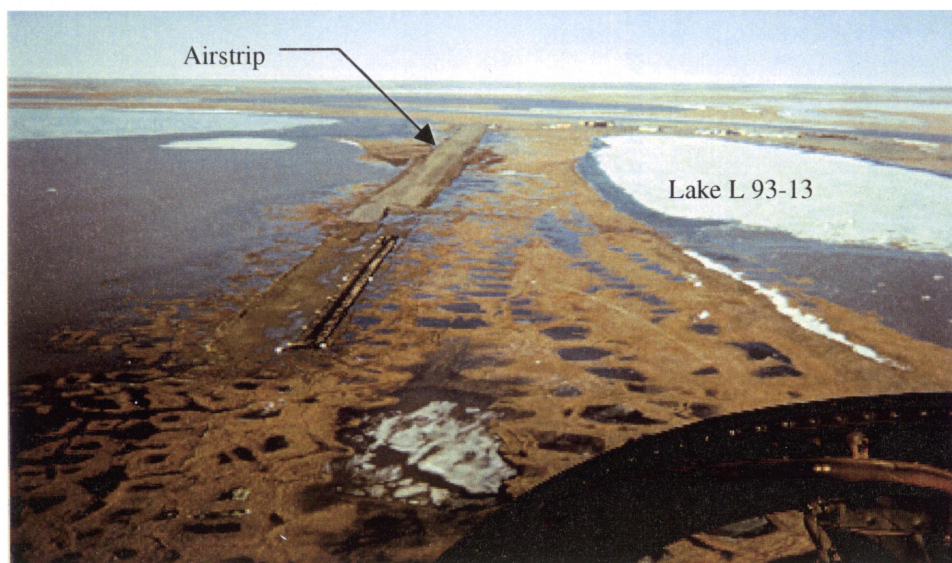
Looking northeast at the proposed airstrip. (5/29/98 approx. 20:00)
